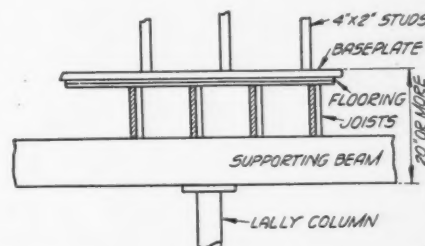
The shrinkage developed in more than 20 in. of timber would cause cracking
